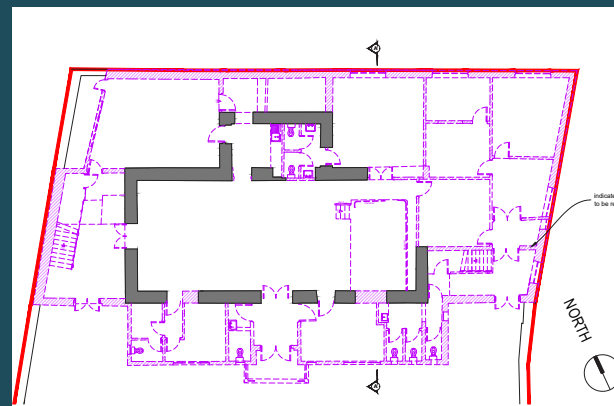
Existing floor plan with original school building shown shaded grey and later additions to be demolished shown dashed magenta
